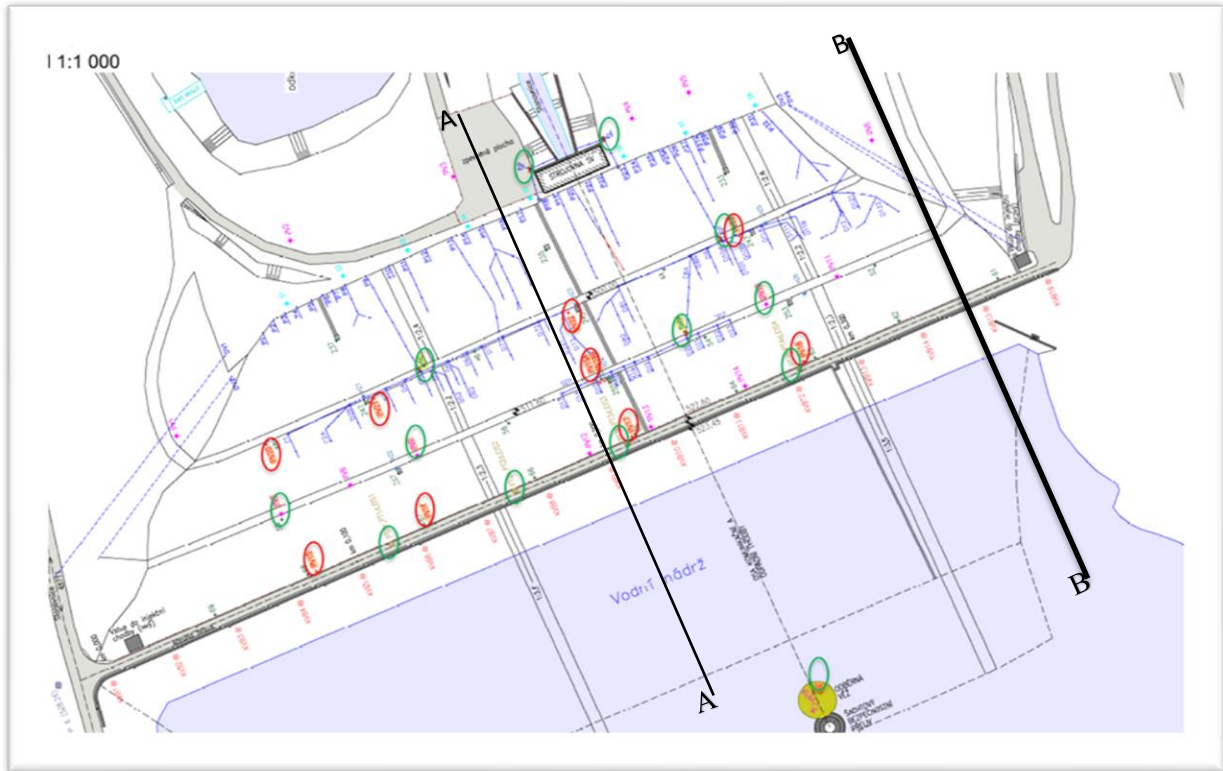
The layout plan of the Karolinka dam with monitoring system (Pařílková et al, 2016)
